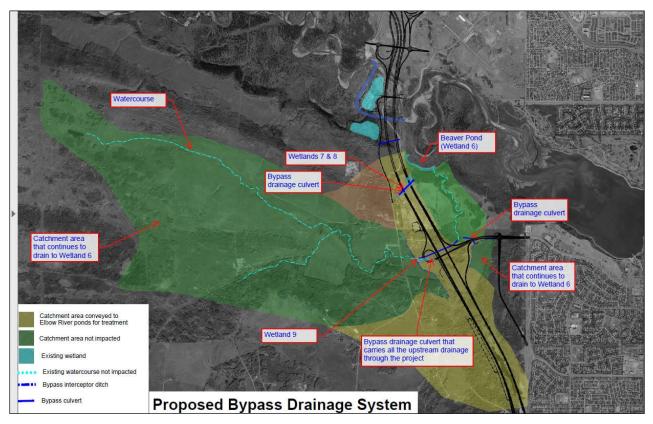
Proposed bypass drainage to maintain surface flow across the Transportation Utility Corridor (TUC) into Beaver Pond, Sept. 2017 (courtesy KGL – construction company SWCRR)
